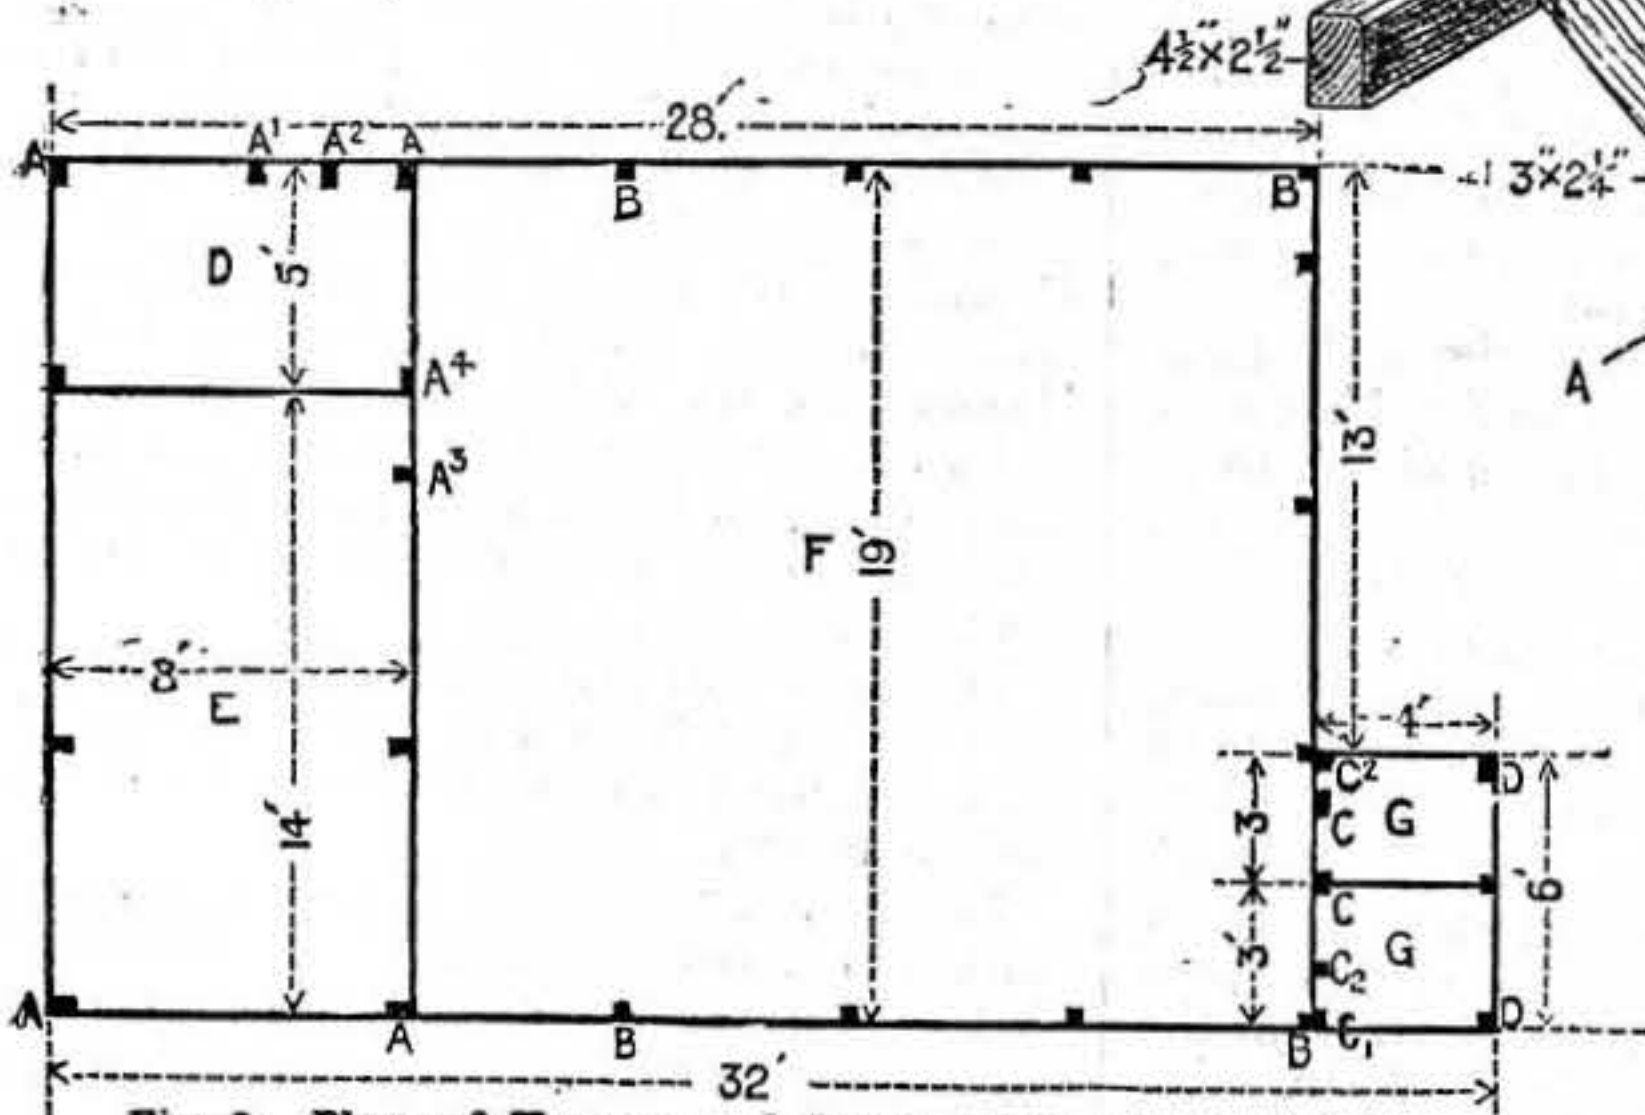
Plan of Houses and Runs, Dimensions shown: D, Large House; E, Run; F, Grass Plot; G, Coops.
